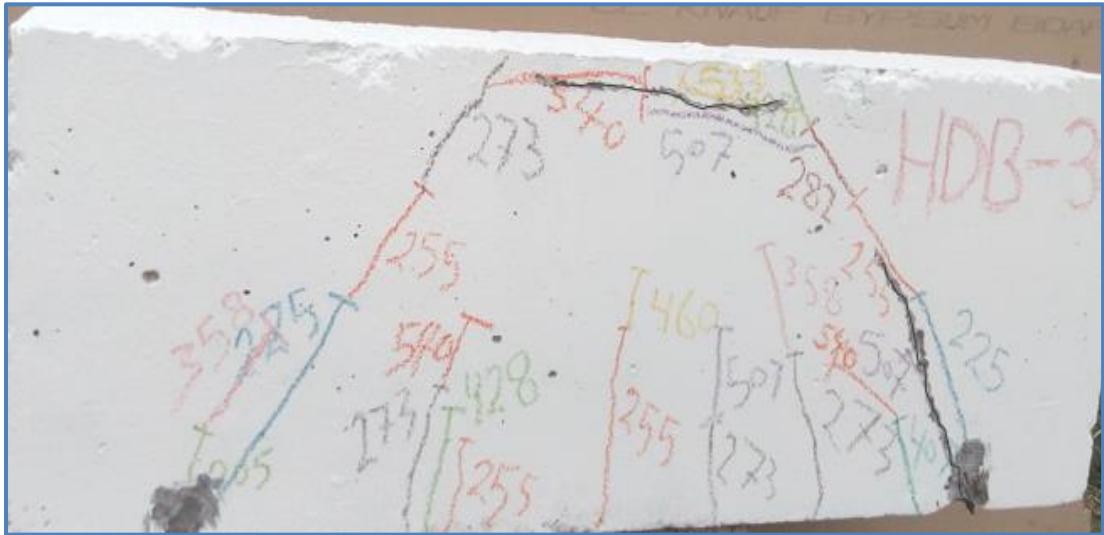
Crack pattern of hybrid deep beam HDB-3 at failure
